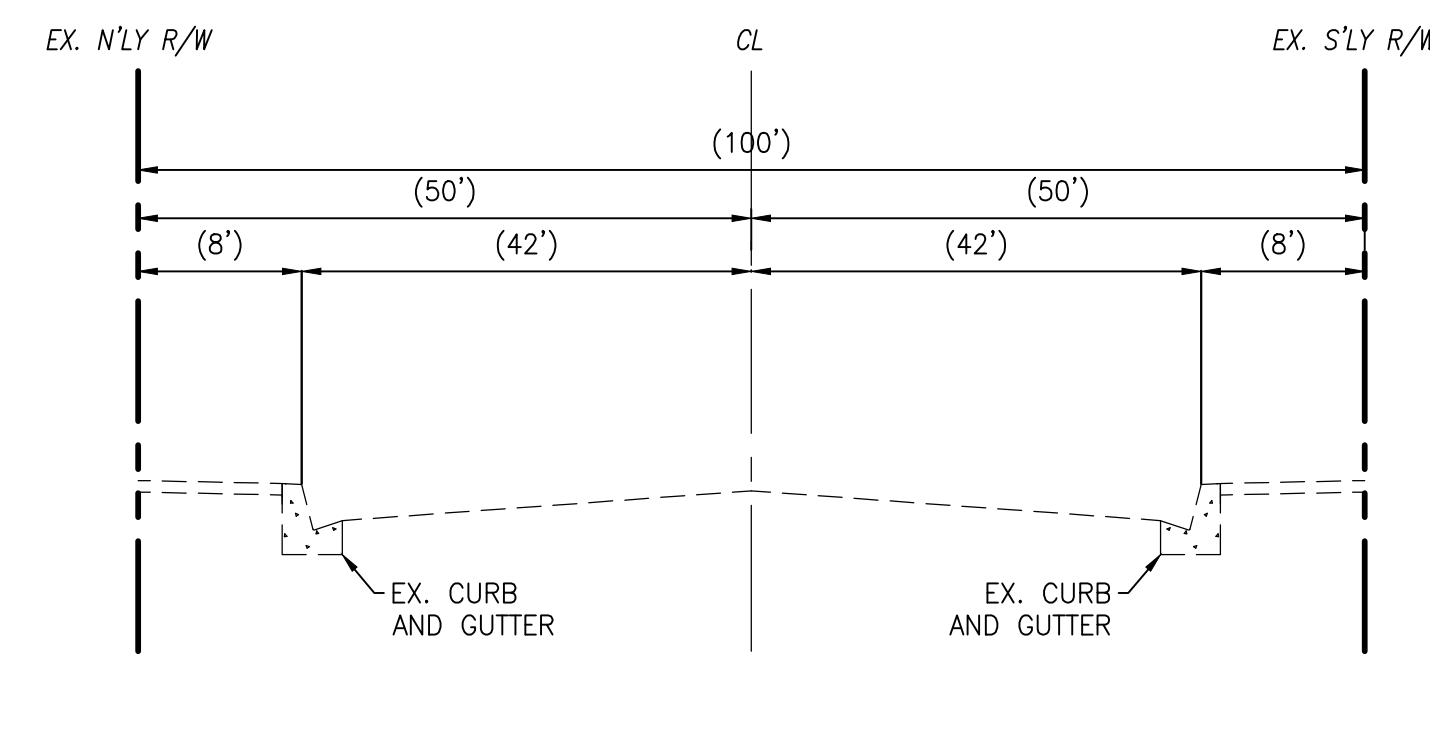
EXISTING EAST WALNUT DRIVE PUBLIC STREET TYPICAL SECTION
